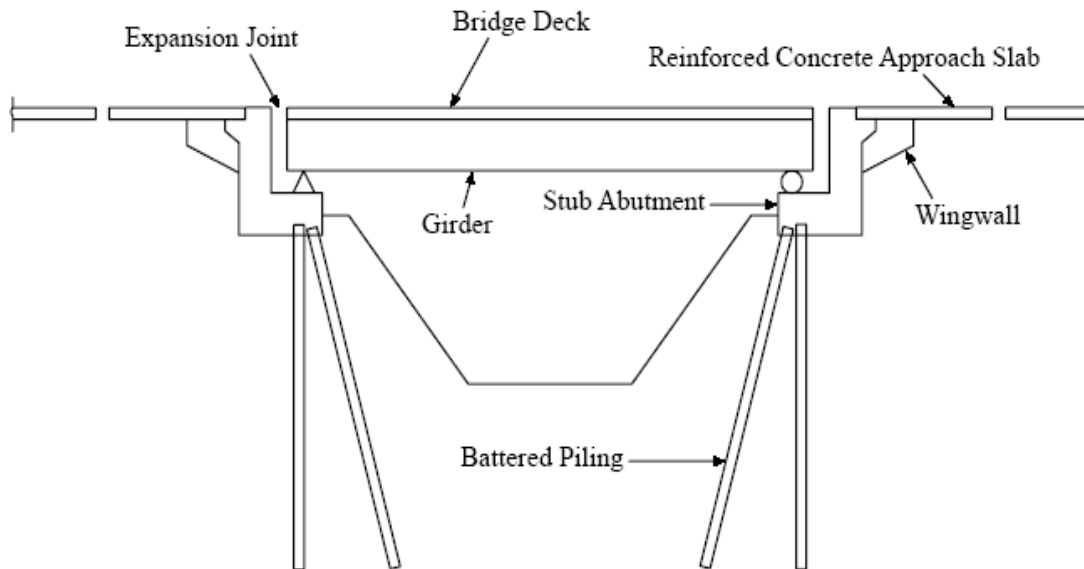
A Simplified Cross Section of a Non-Integral Abutment Bridge
